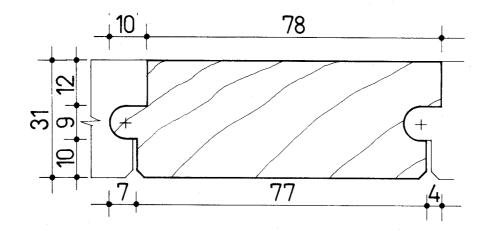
100 mm x 40 mm TONGUE AND GROOVE SECRET NAIL FLOORING (full size)
